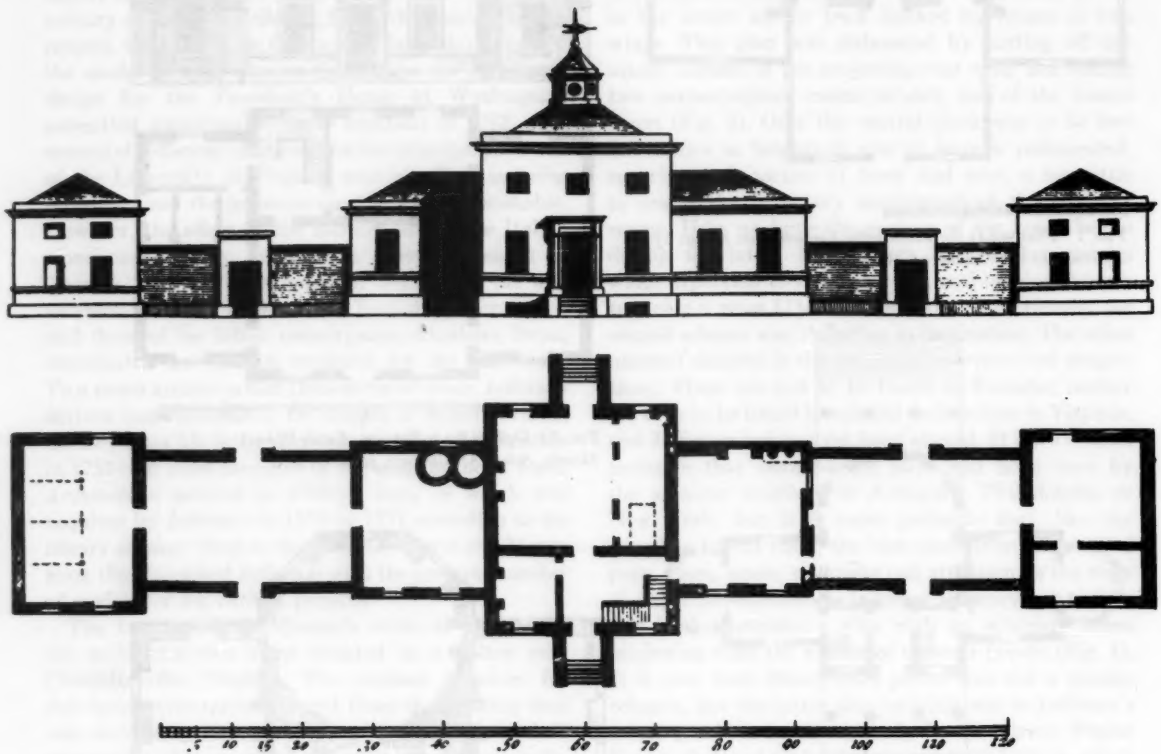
Elevation and plan for a country seat. *Select Architecture*, plate 3.
